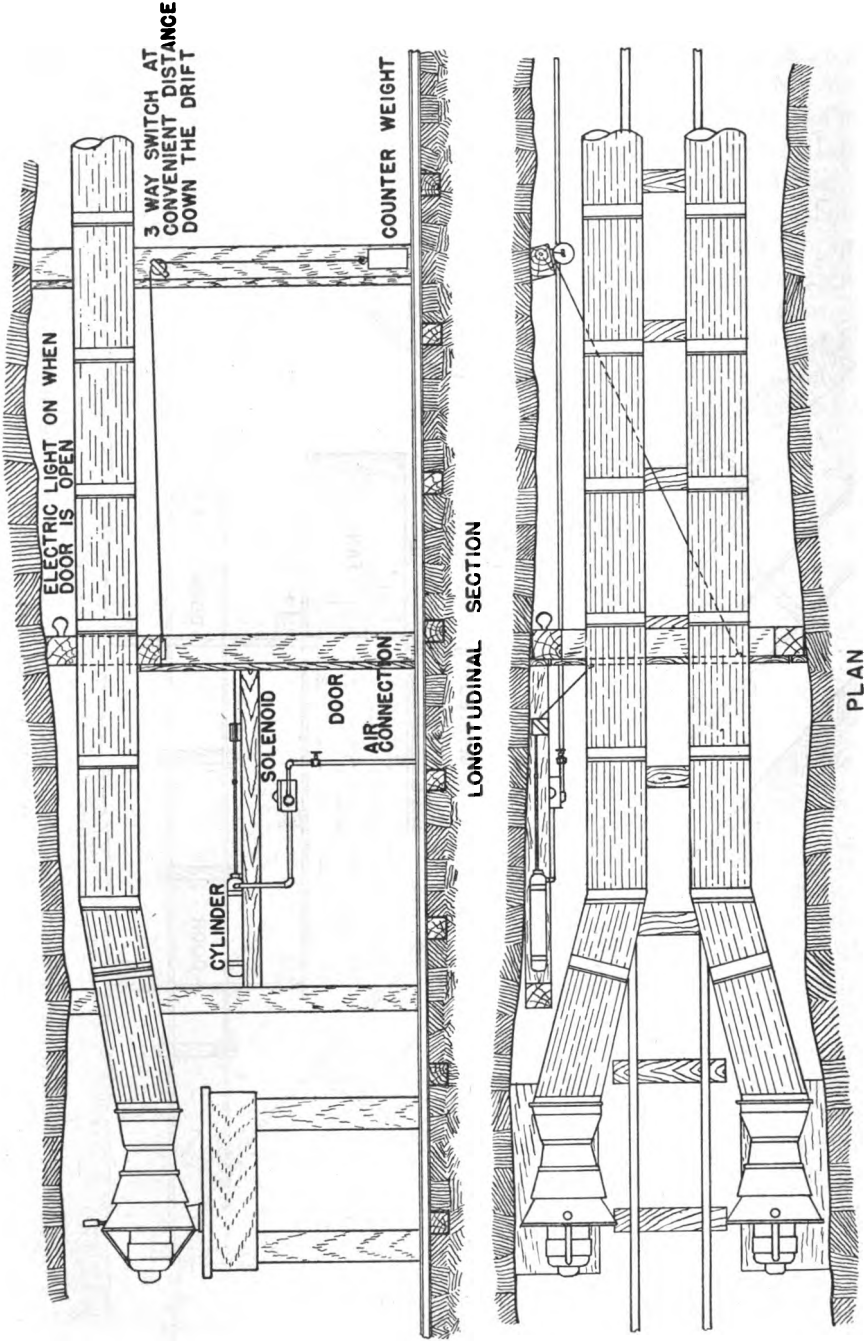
AIR DOOR AND SECONDARY FAN INSTALLATION. (REPRINTED FROM BUREAU OF MINES INFORMATION CIRCULAR 6360.)
